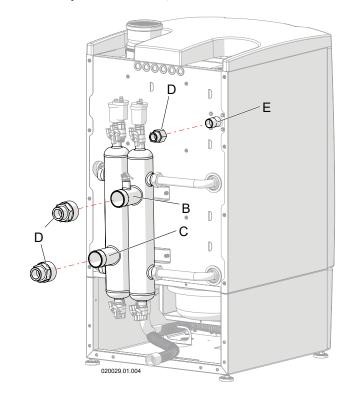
Assembly of flanges and reductions on threaded connections for hot water outlet, cold water inlet and gas
